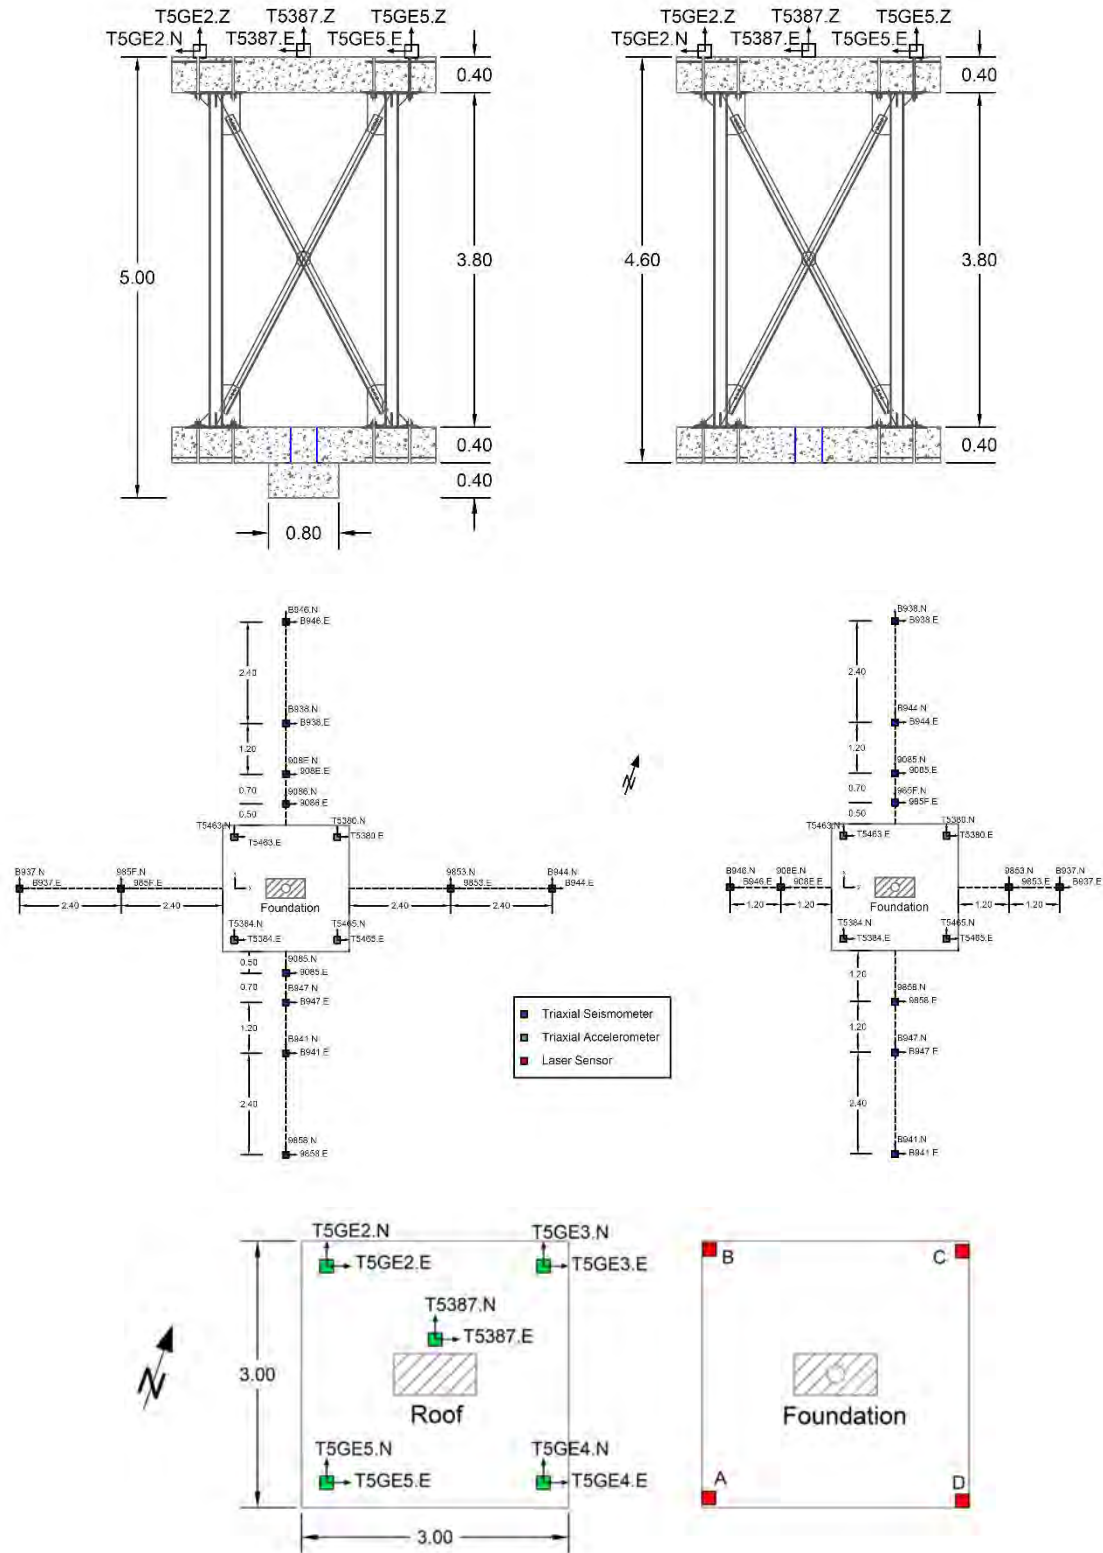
Cross section of the instrumentation layout of the structure with the new concrete foundation (upper left) and the conventional foundation (upper right), plan view of the instrumentation layout of the foundation and the soil surface with the new concrete foundation (middle left) and the conventional foundation (middle right) and plan view of the instrumentation layout of the roof (bottom left) and the position of the laser sensors at the foundation (bottom right) in both experimental series
